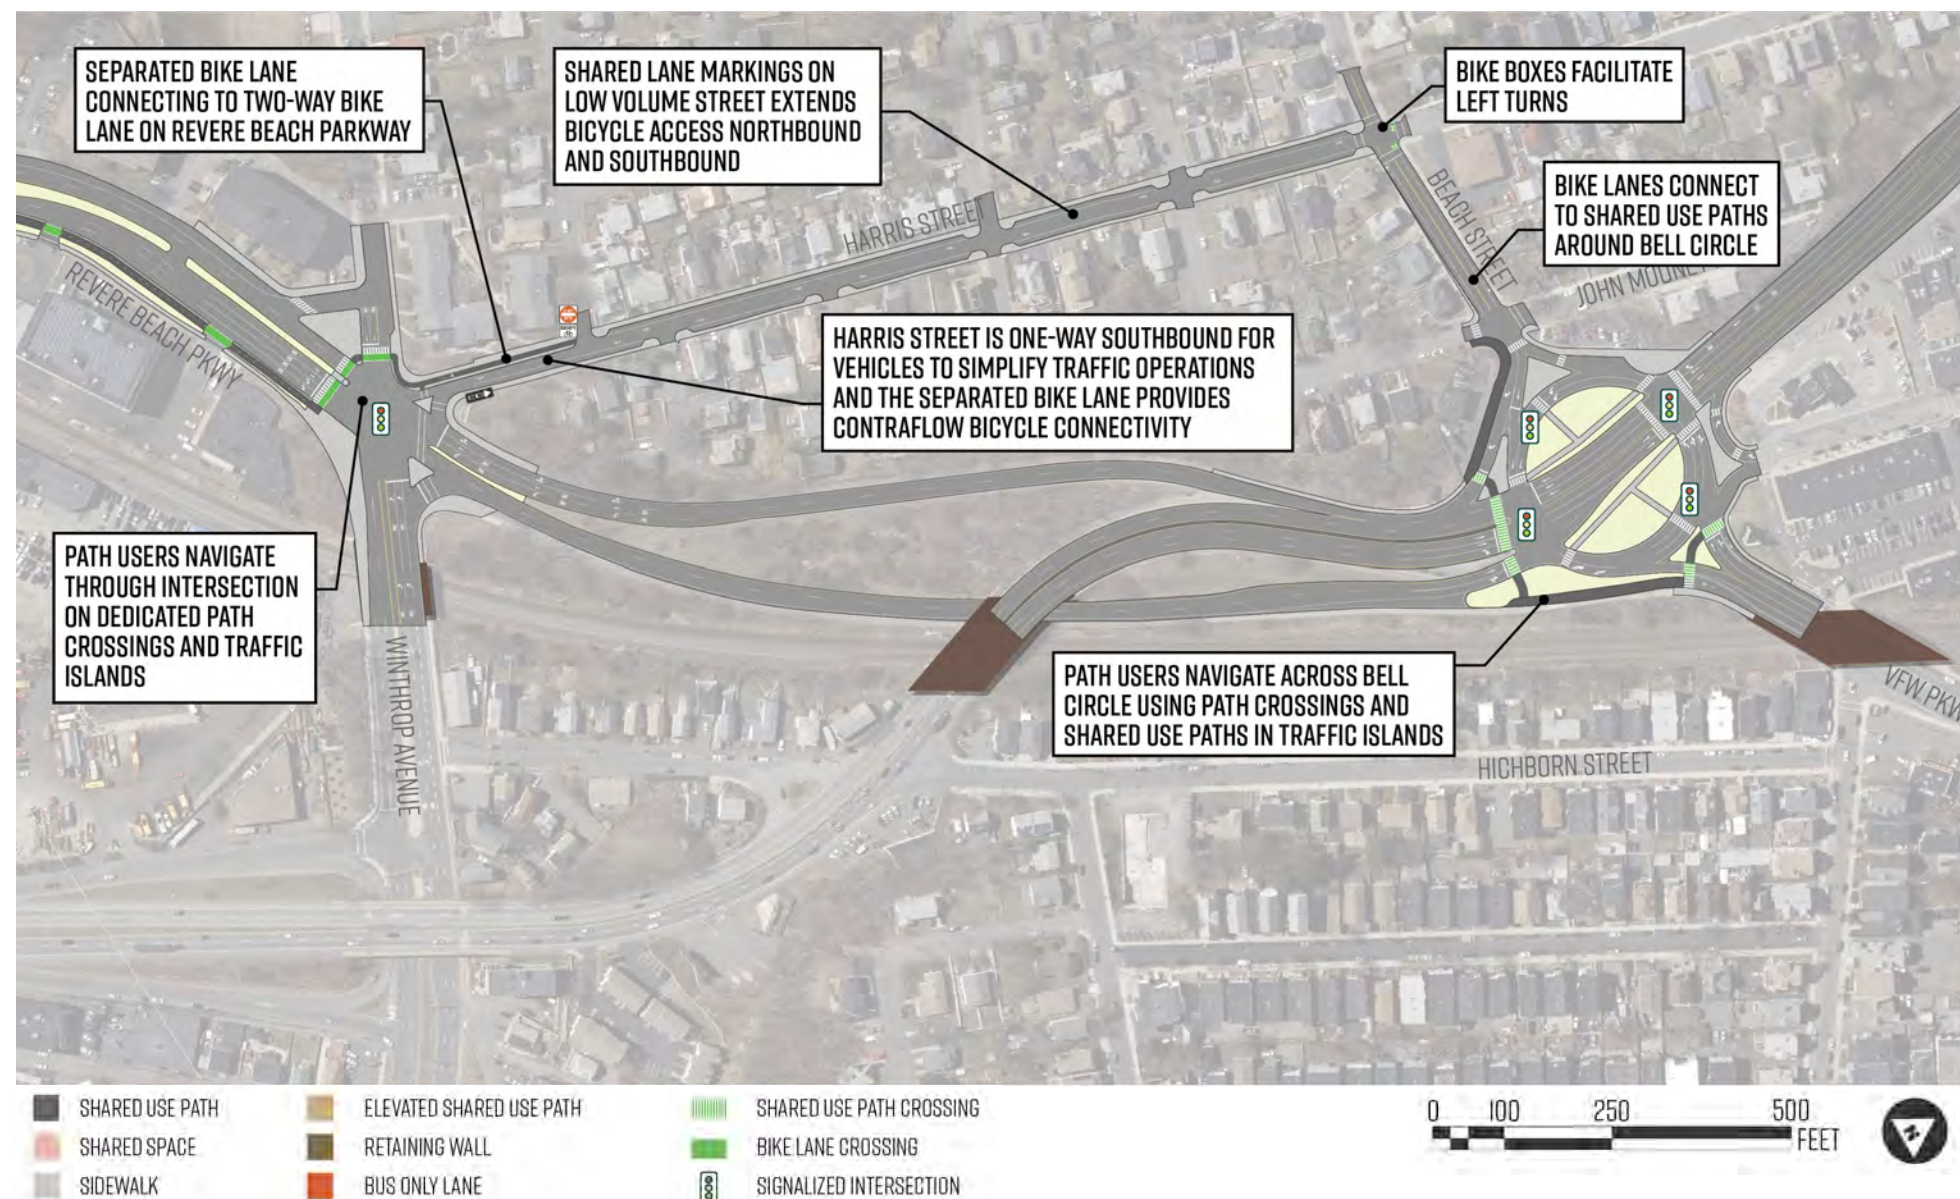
Railroad Street to Bell Circle – Option A (Harris Street) – Railroad Street to Winthrop Avenue
